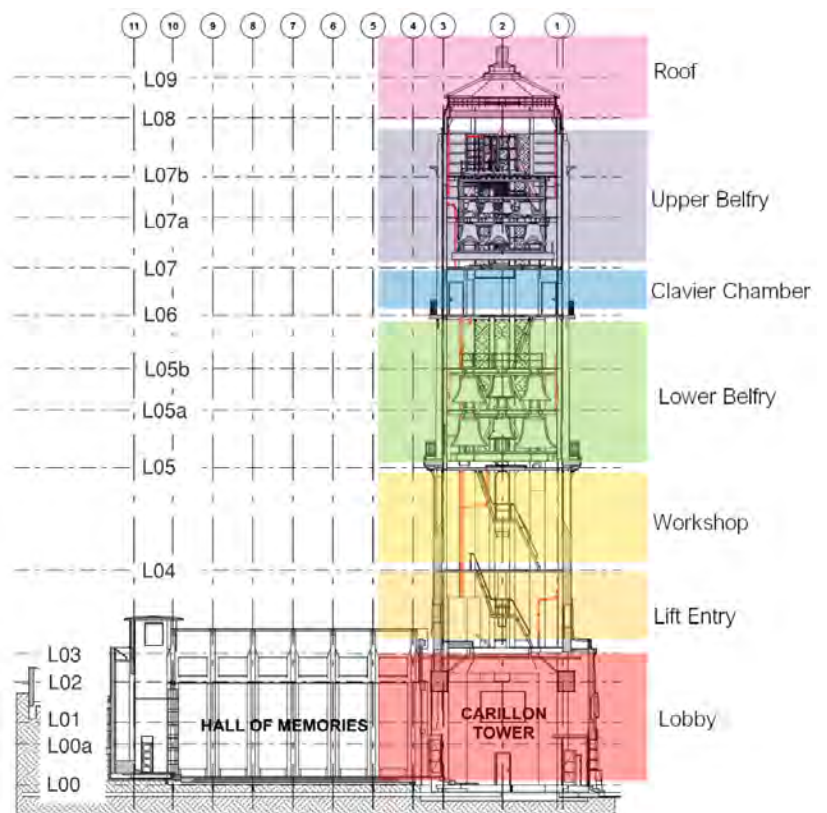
Section showing layout of the Carillon (Studio Pacific Architecture 2023).
